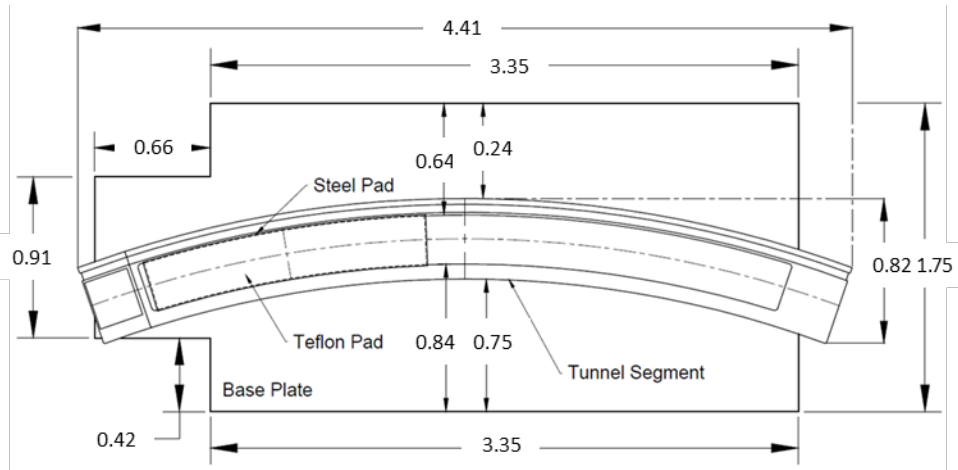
Plan view of load pad location at top and bottom of segment (dimensions in m).
